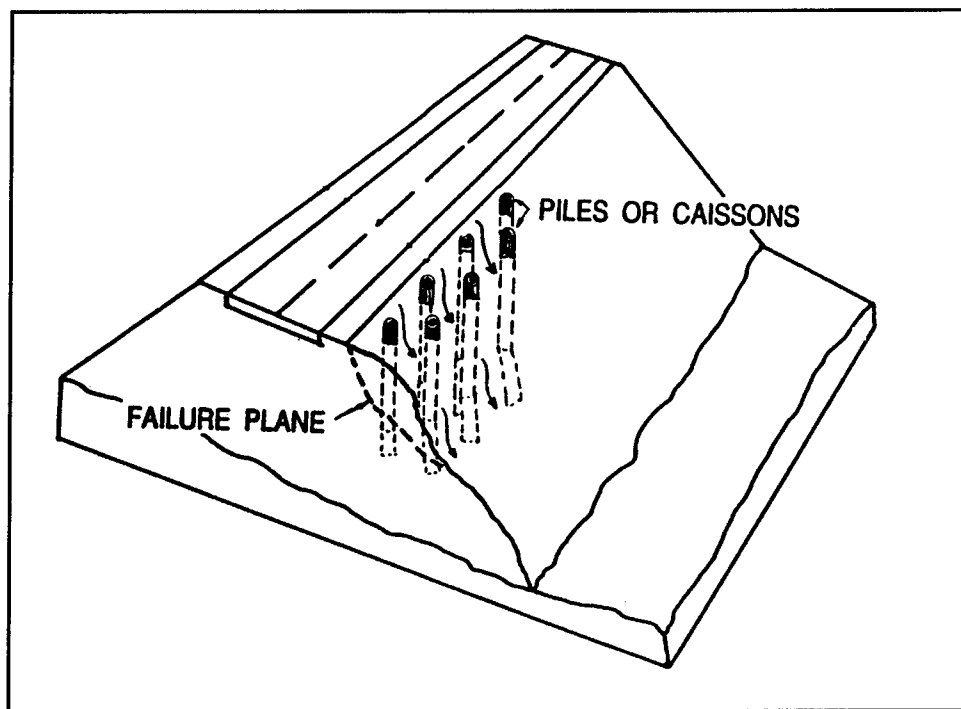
Restraint structure used to stabilize slope (from Hopkins et al. 1988)
